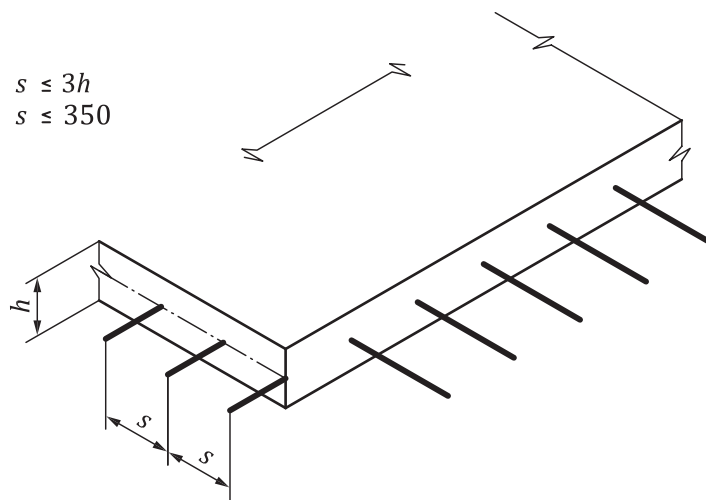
Spacing between shrinkage and temperature reinforcement in slabs
